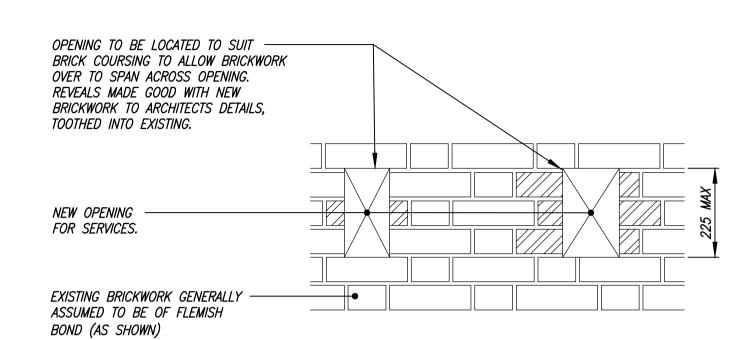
OPENINGS THROUGH EXISTING MASONRY: (ISOLATED SMALL OPENINGS >150mm & <300mm WIDE.) 1:10
